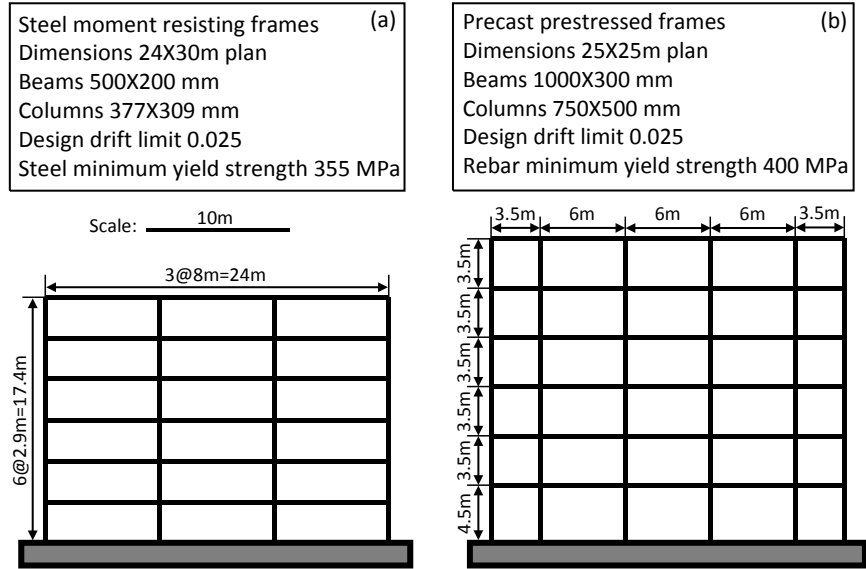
Frame buildings for the design SDOF example structures: (a) steel moment resisting frame building [63] and (b) hybrid precast prestressed frame building [55].
